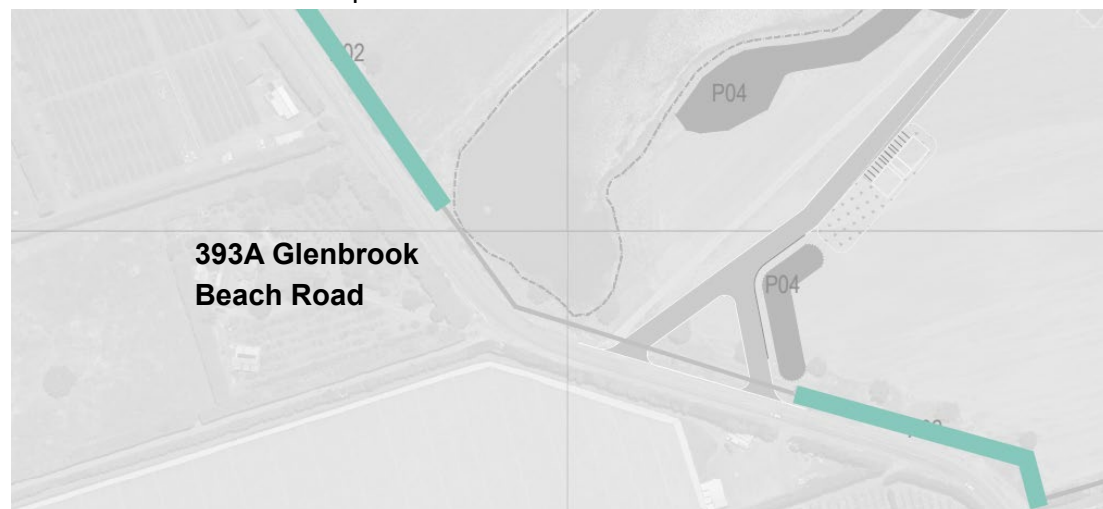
Mitigation planting (Teal) and 393A Glenbrook Beach Road
